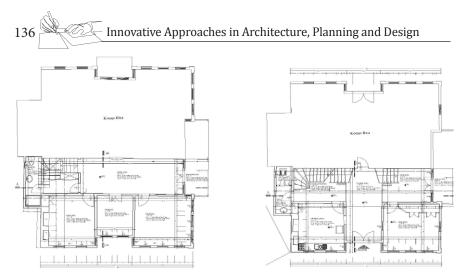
Handan Tekin House's ground floor plan and first floor plan
